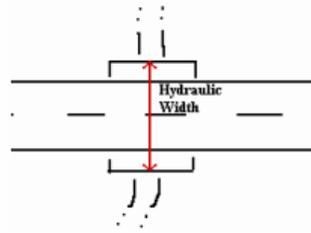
Rapid Field Survey - Hydraulic Width of Culvert
